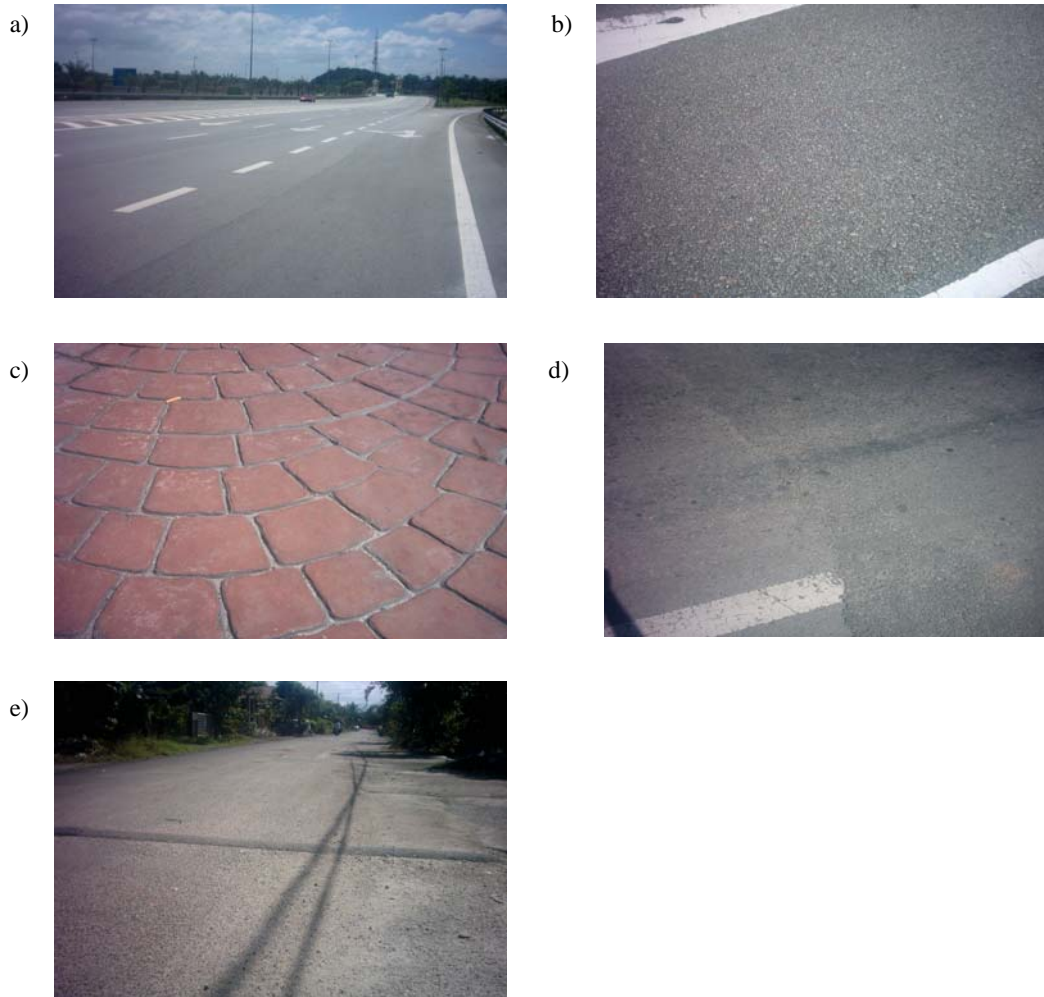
Road surfaces: a) highway, b) urban road, c) pavement road, d) suburban road, e) bumpy road.
